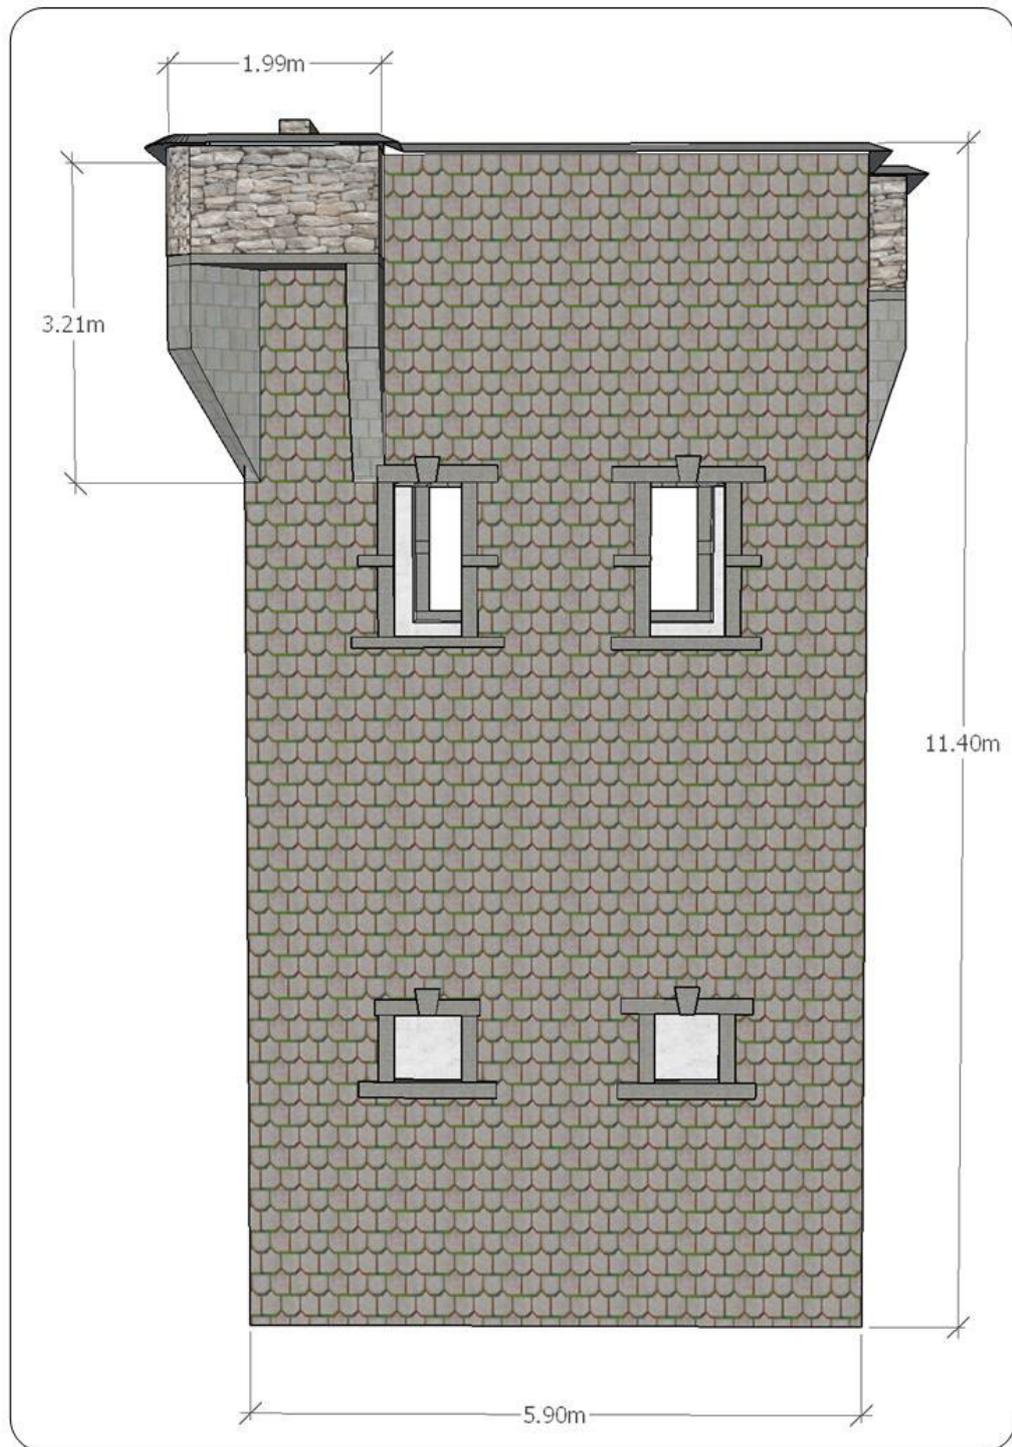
Rendered 3D model for an idealised tower showing side wall elevation with windows and bartizan.
